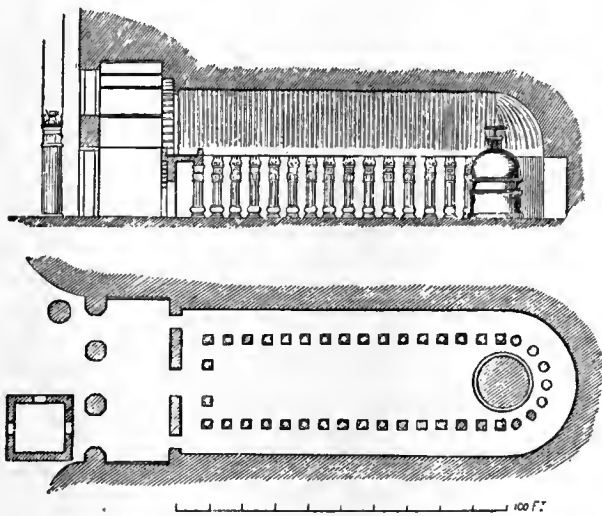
Cave at Kārli near Bombay. Section and plan.
